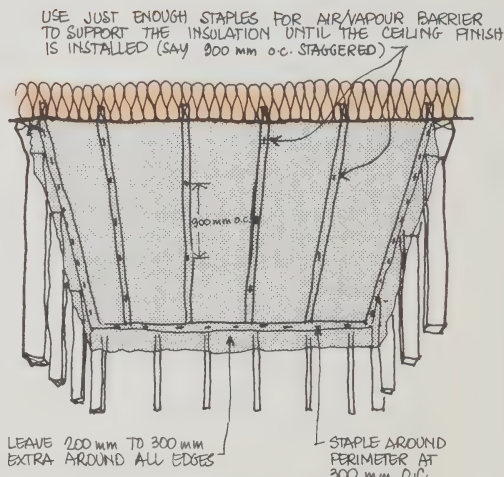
INSTALLATION OF AIR/VAPOUR BARRIER ON CEILINGS
